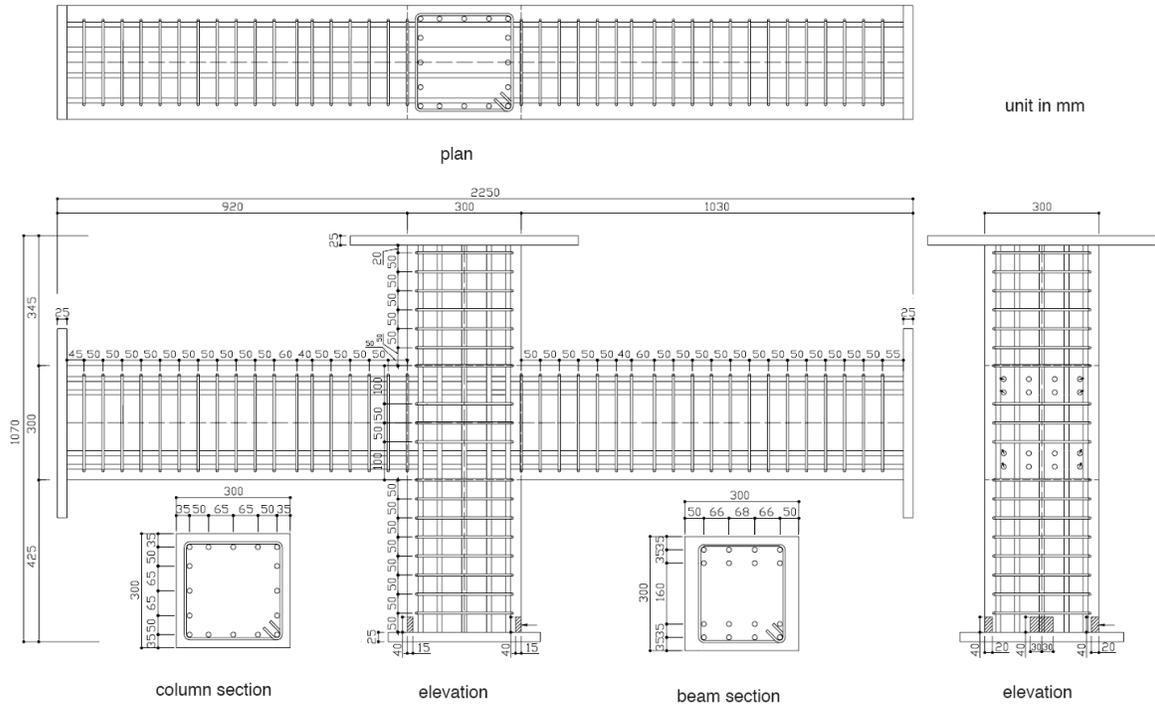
Dimensions and Detailing of Specimens A1 and A2
